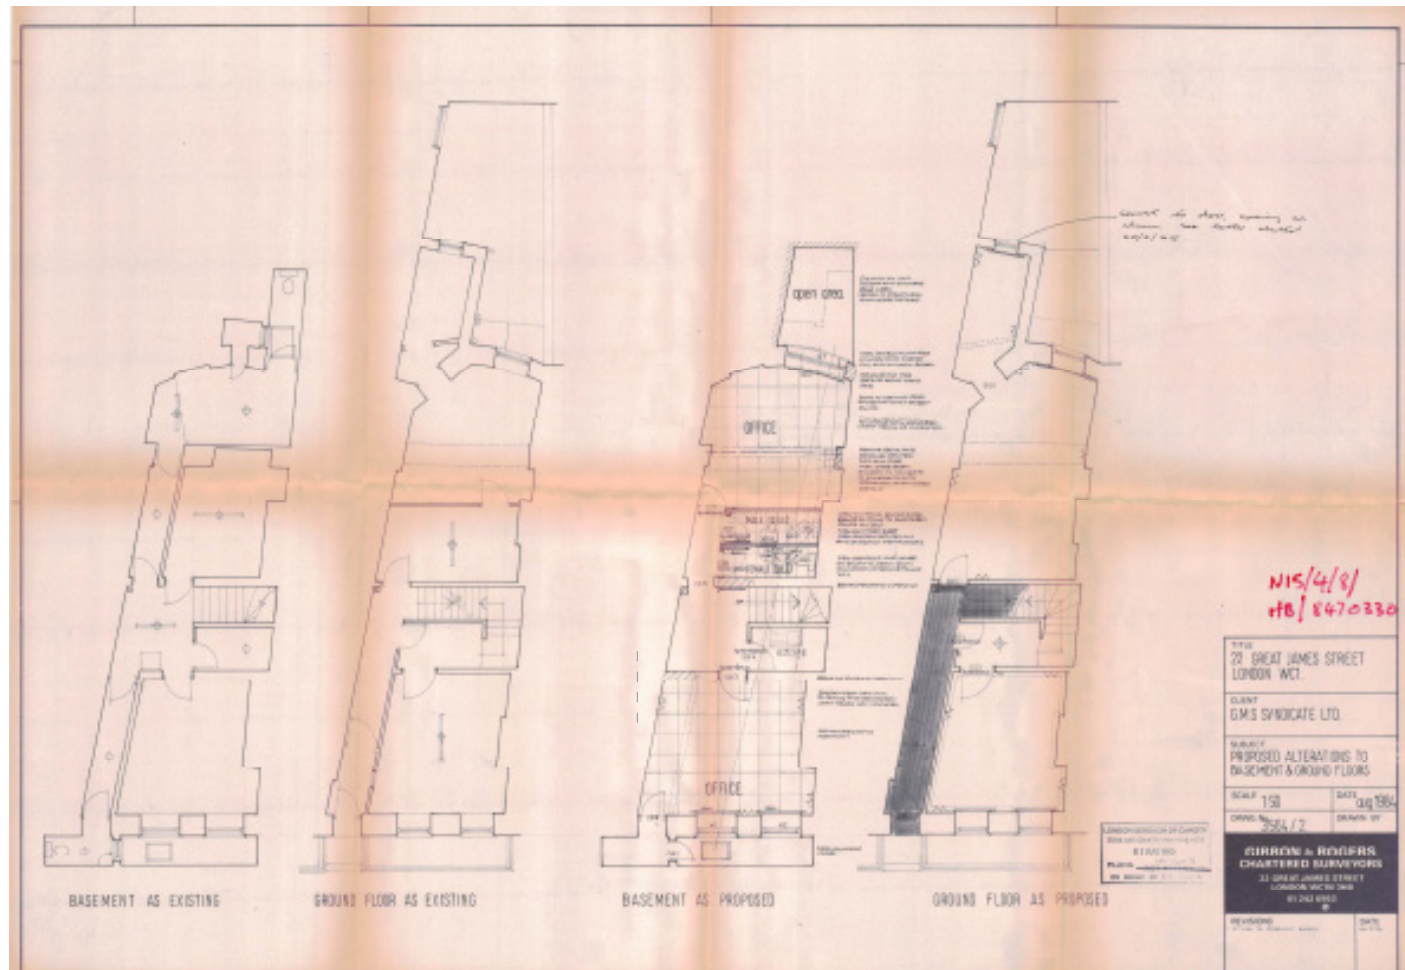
Plans submitted in 1984 showing the existing and proposed plans for the ground and basement floors of No.22.
